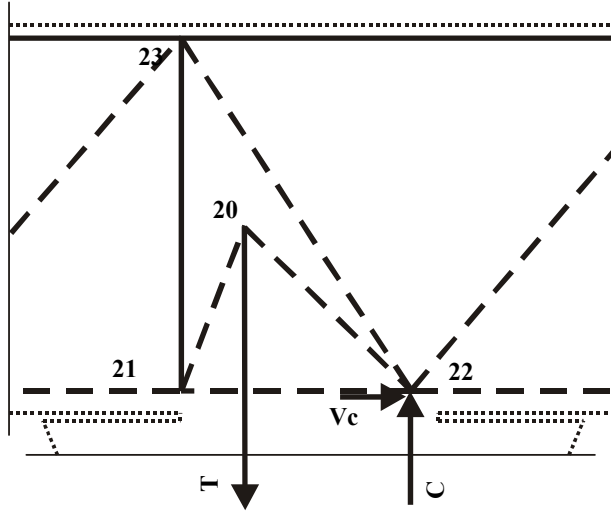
Strut-And-Tie Model at the East Beam-Column Connection D-Region
